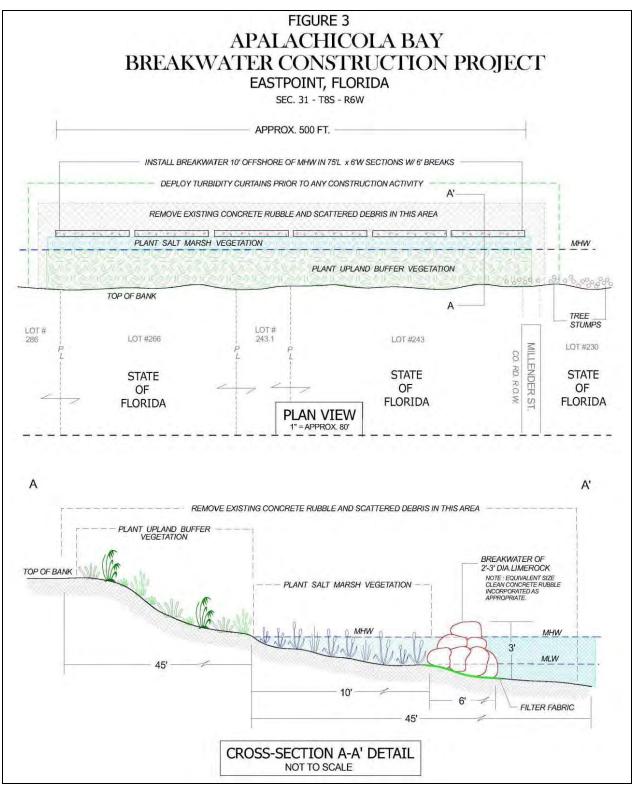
Schematic diagrams (plan and cross-sectional views) of Cat Point breakwater and planting design.
